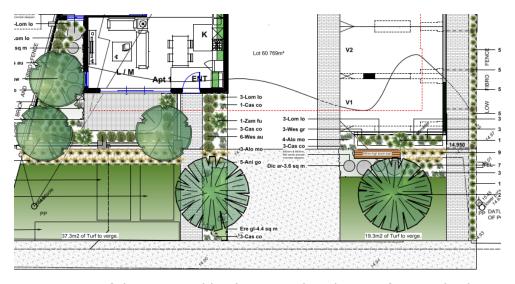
Extract of the proposed landscaping plan showing front setback area.
